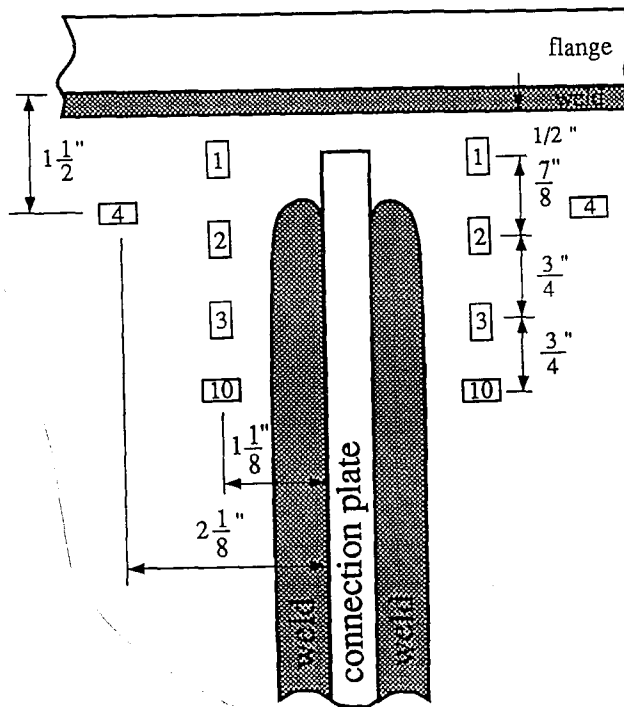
Numbering and Locations of Strain Gages on Girder Web
